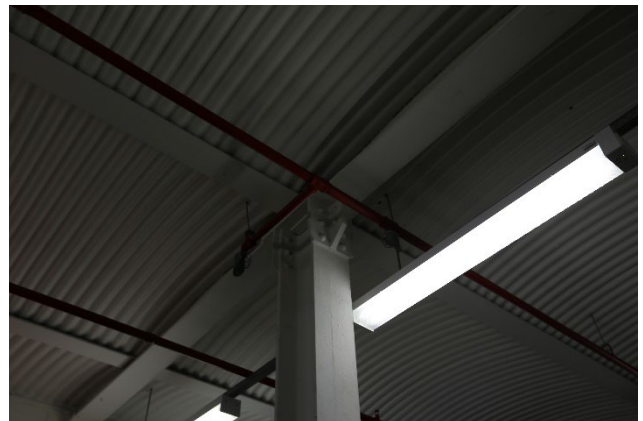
Detail of steel column and arched corrugated iron sheeting.
